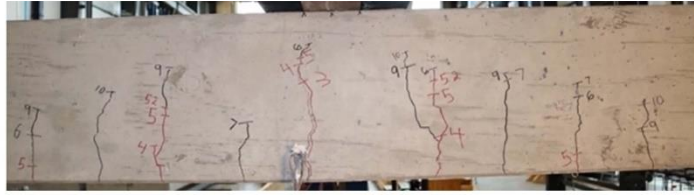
Cracking condition of specimens at yielding of the tension reinforcement steel
